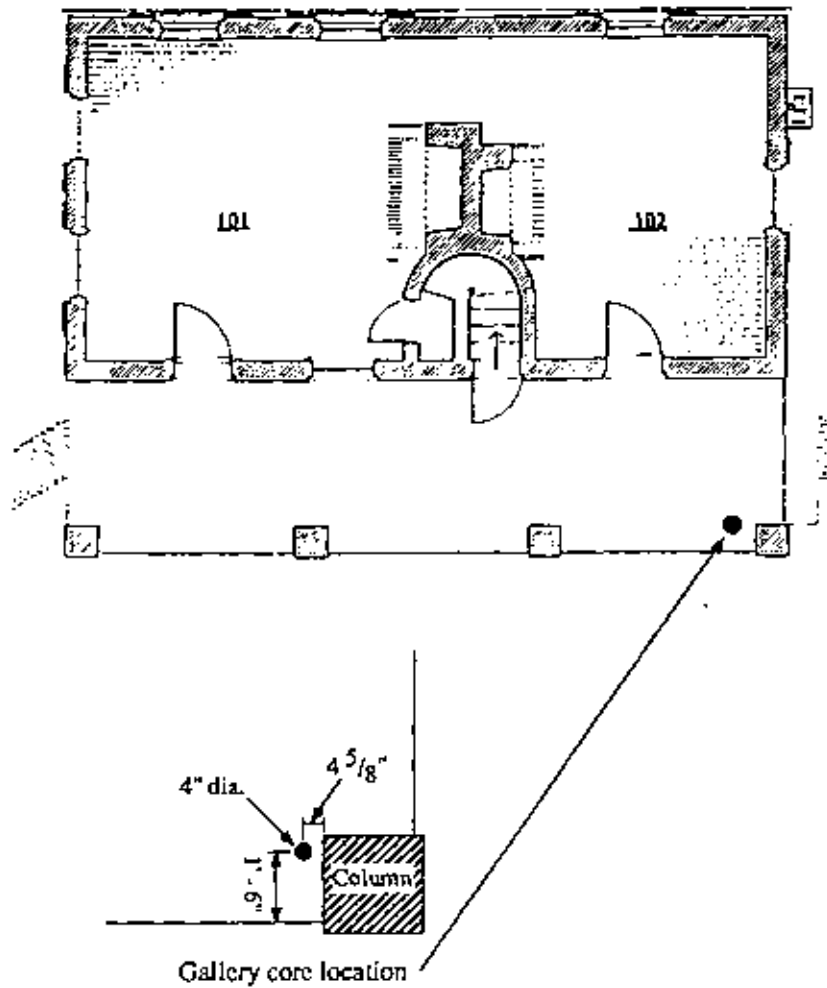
Melrose Kitchen Building Plan - Location of Core on Gallery
